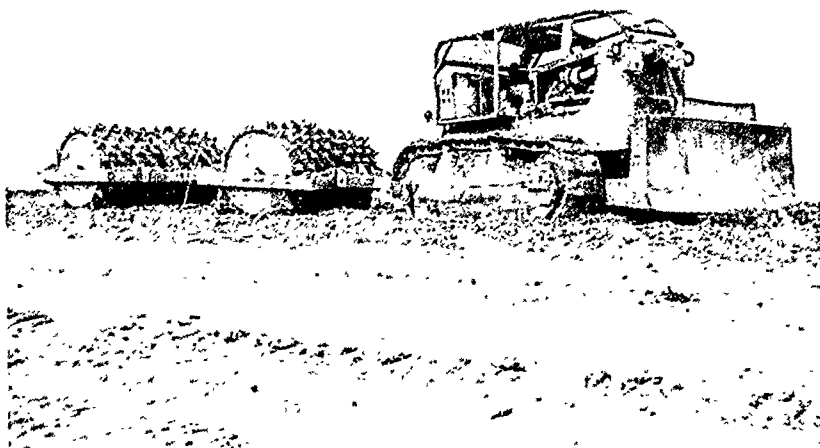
Fill placement w/twin sheepsfoot rollers, Jan 63.
